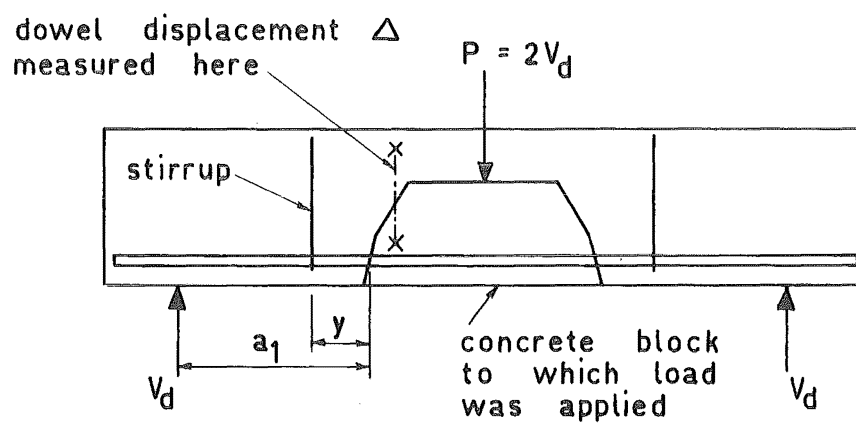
Dowel Test Beams of Baumann<sup>12</sup>
